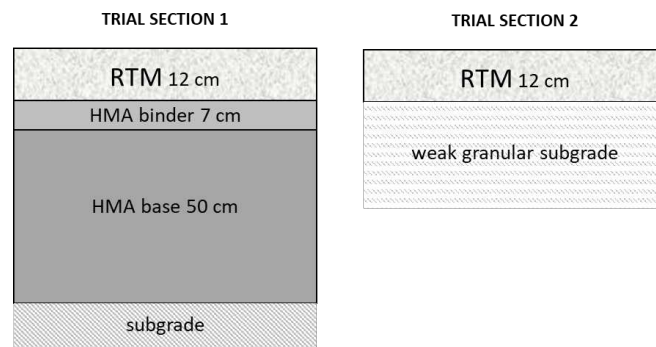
Pavement structure scheme for trial section 1 and trial section 2
